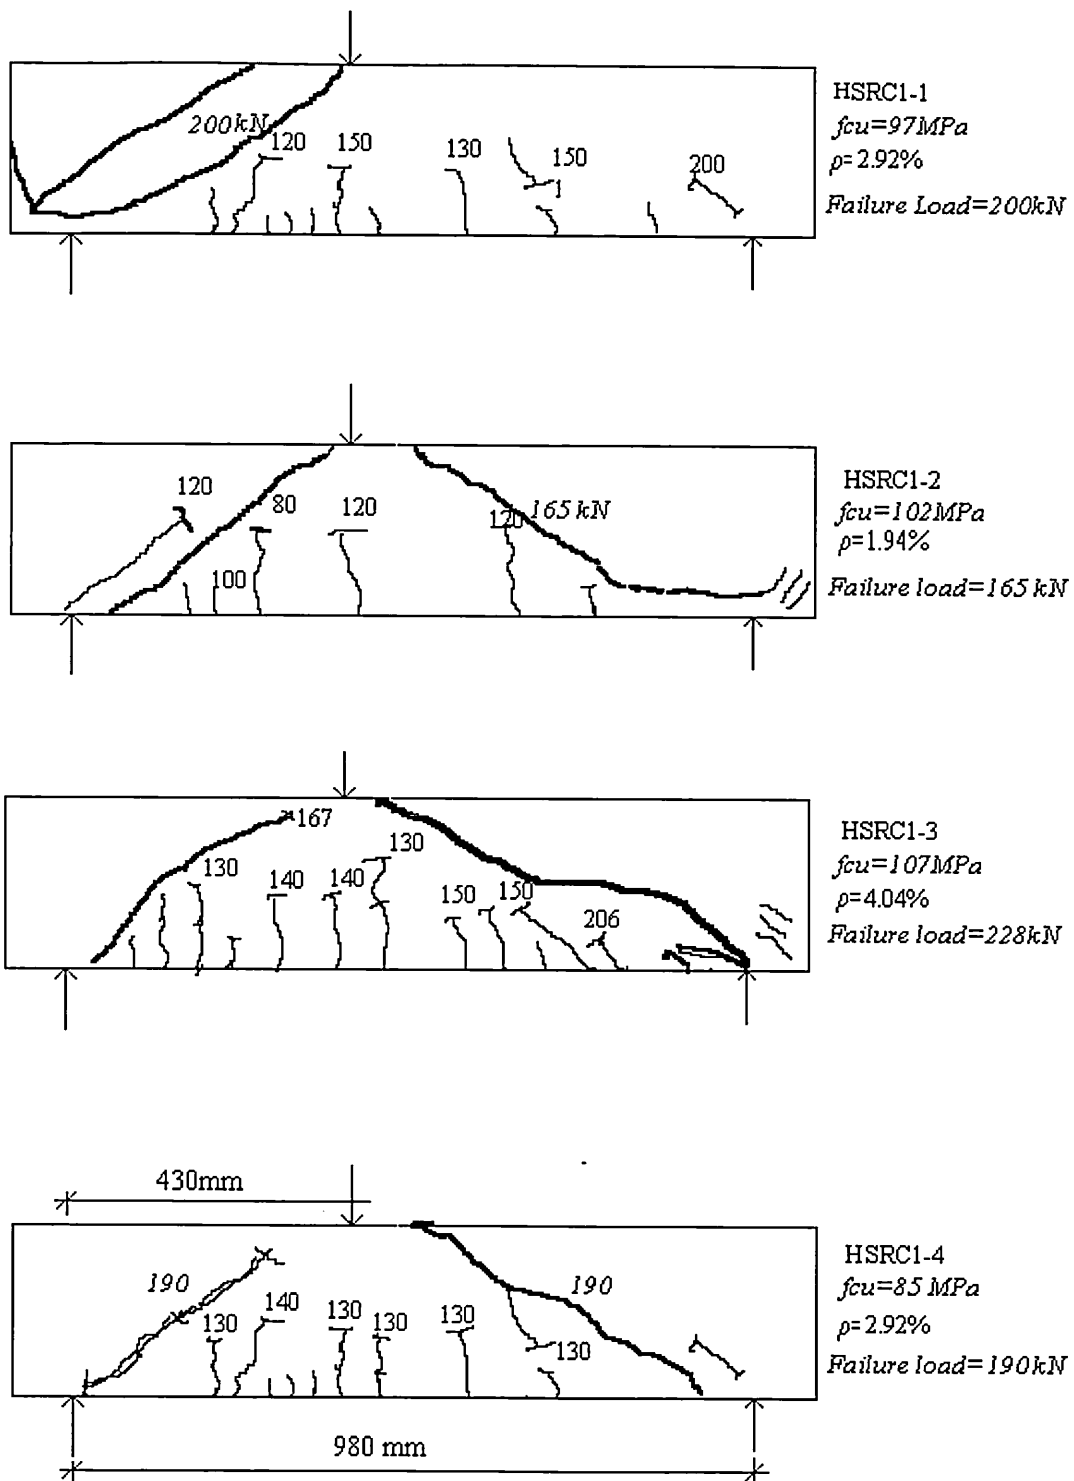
Cracking Patterns of Beams Group I ($a/d=2$)
